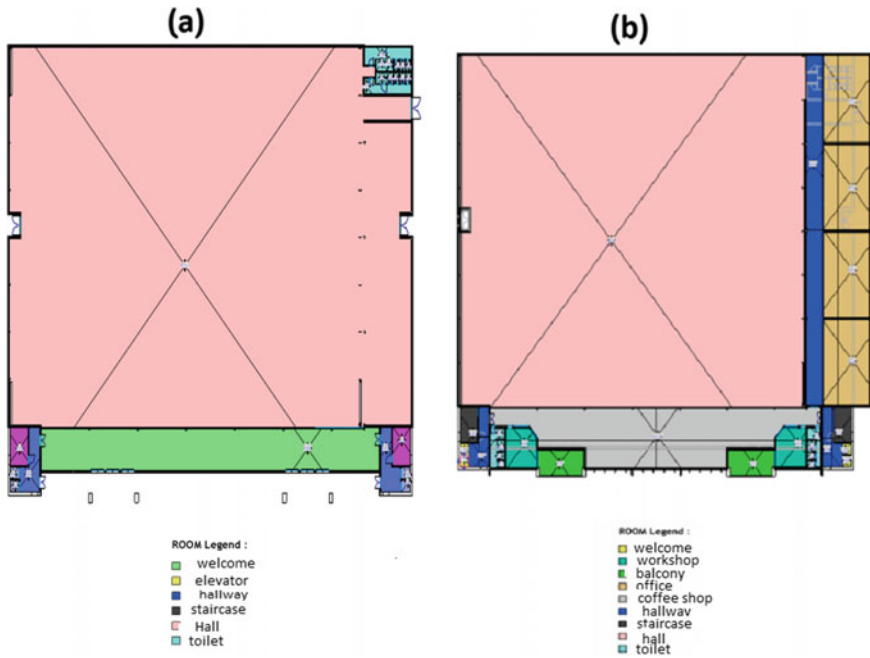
Exhibition hall plan: a the ground floor, b the mezzanine
